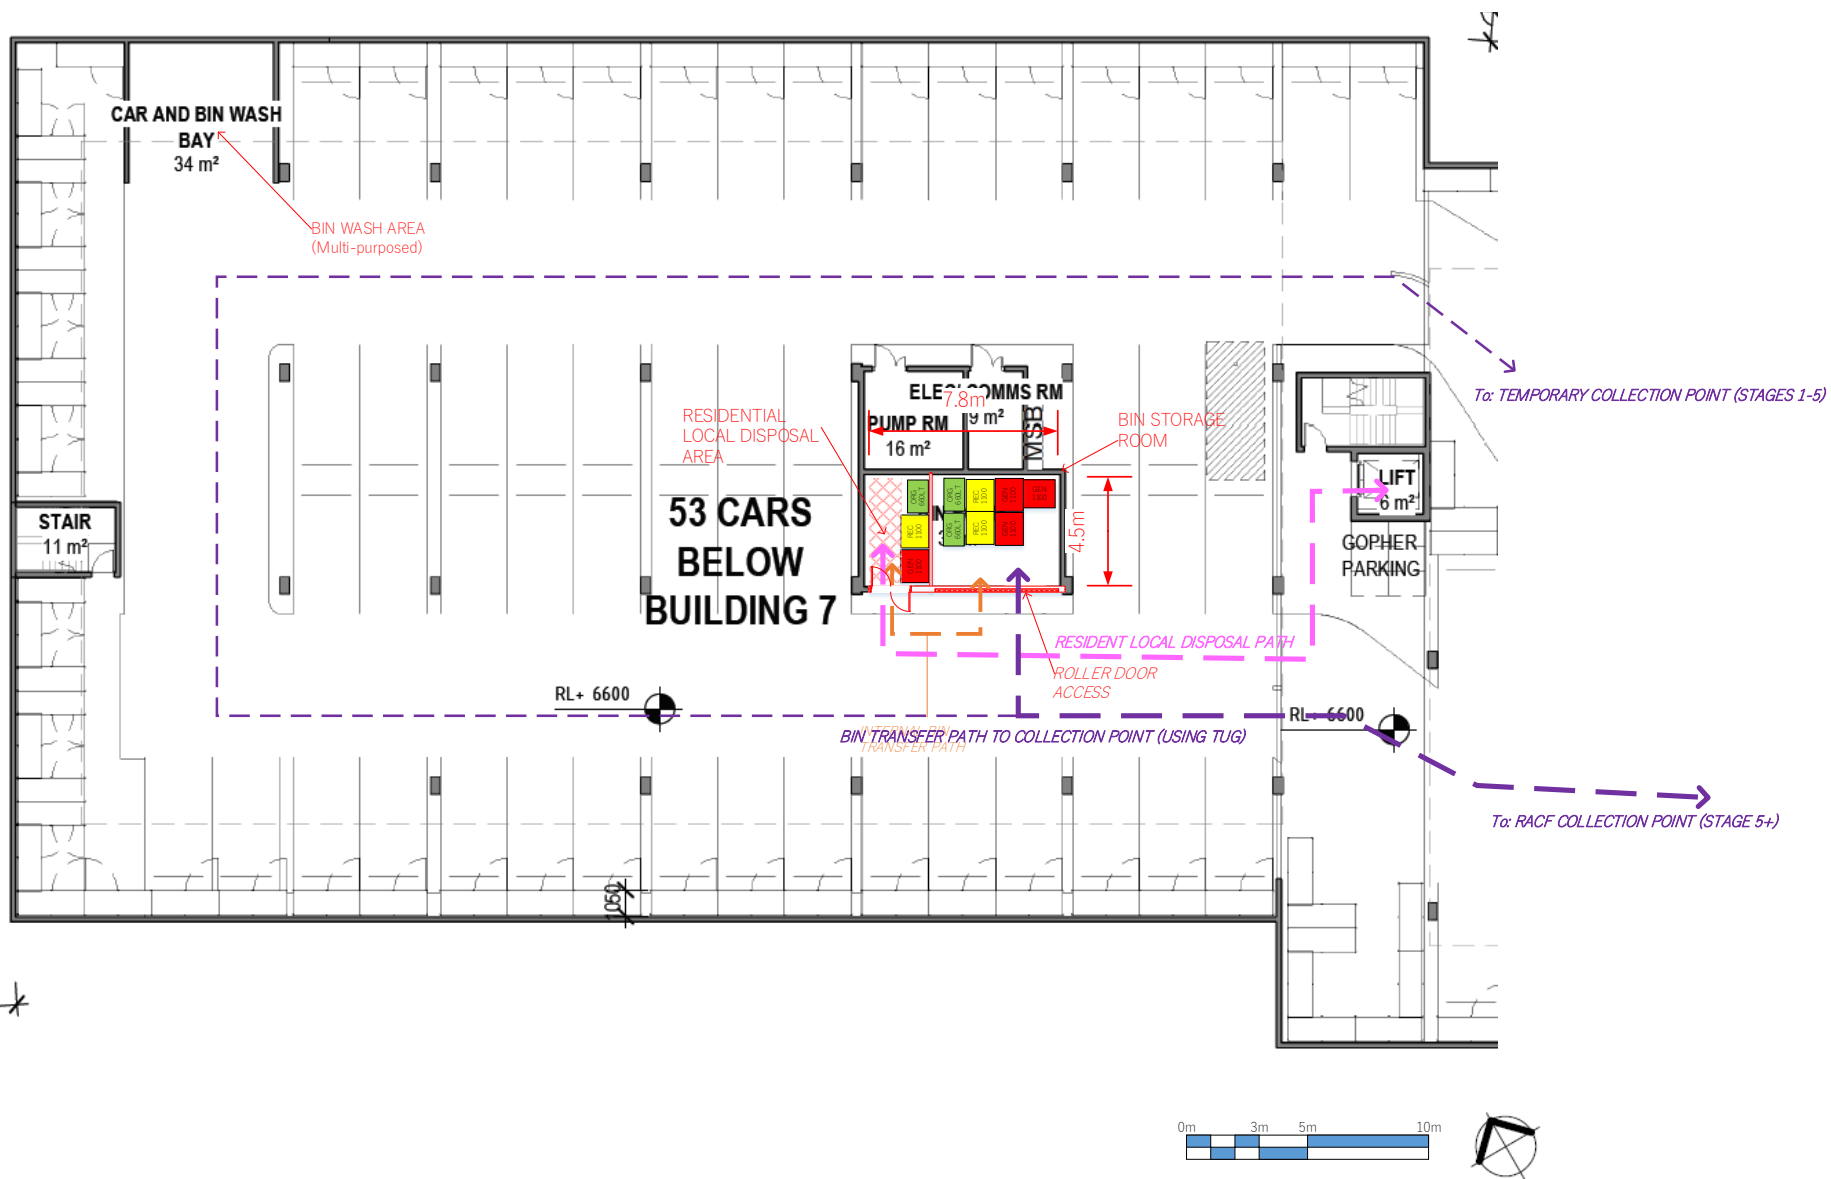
Building 7 Waste Storage + On-site bin wash area
